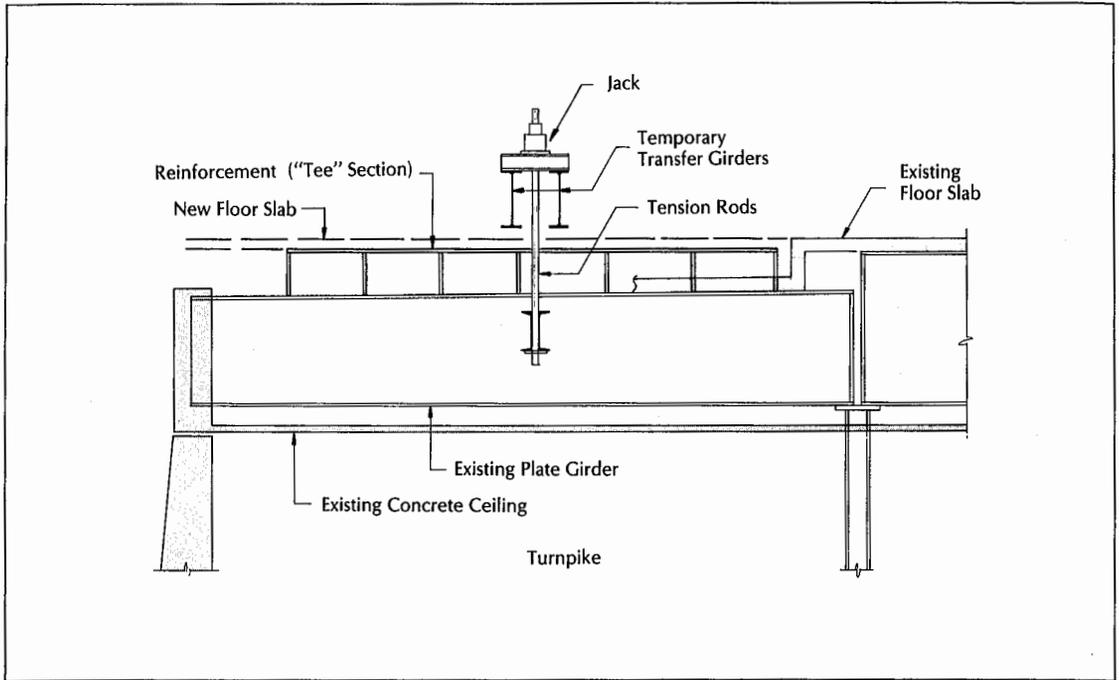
Section for reinforcing existing plate girders over the turnpike/railroad area showing the use of temporary transfer girders and jack.
